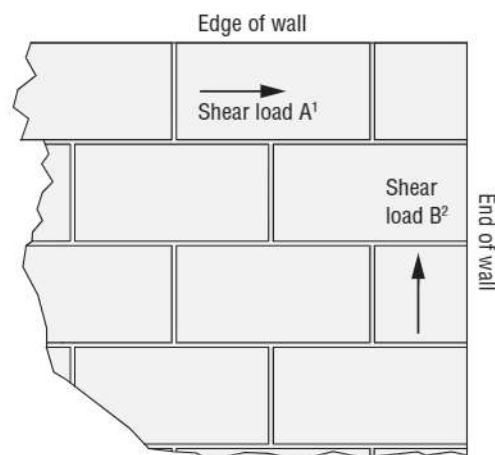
Direction of Shear Load in Relation to Edge and End of Wall
